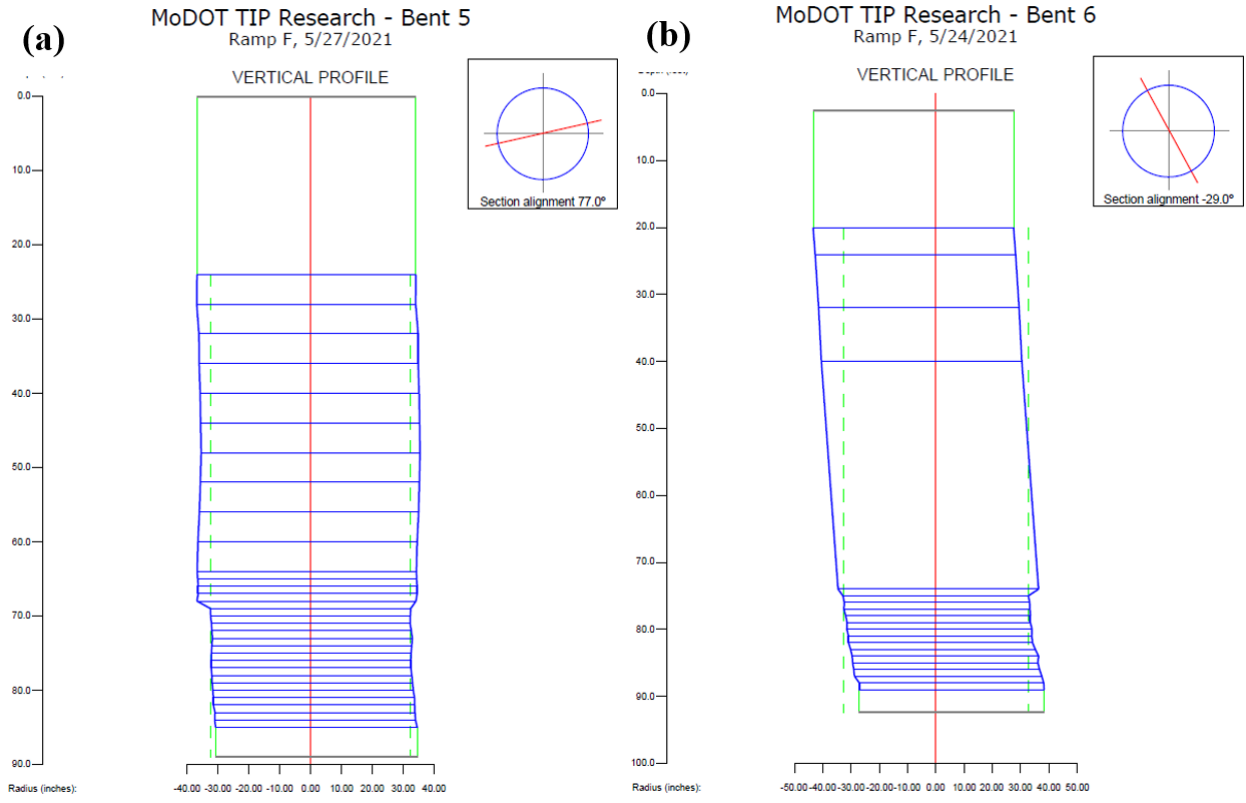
SONICaliper shaft profiles for Ramp F: (a) Bent 5 and (b) Bent 6.
